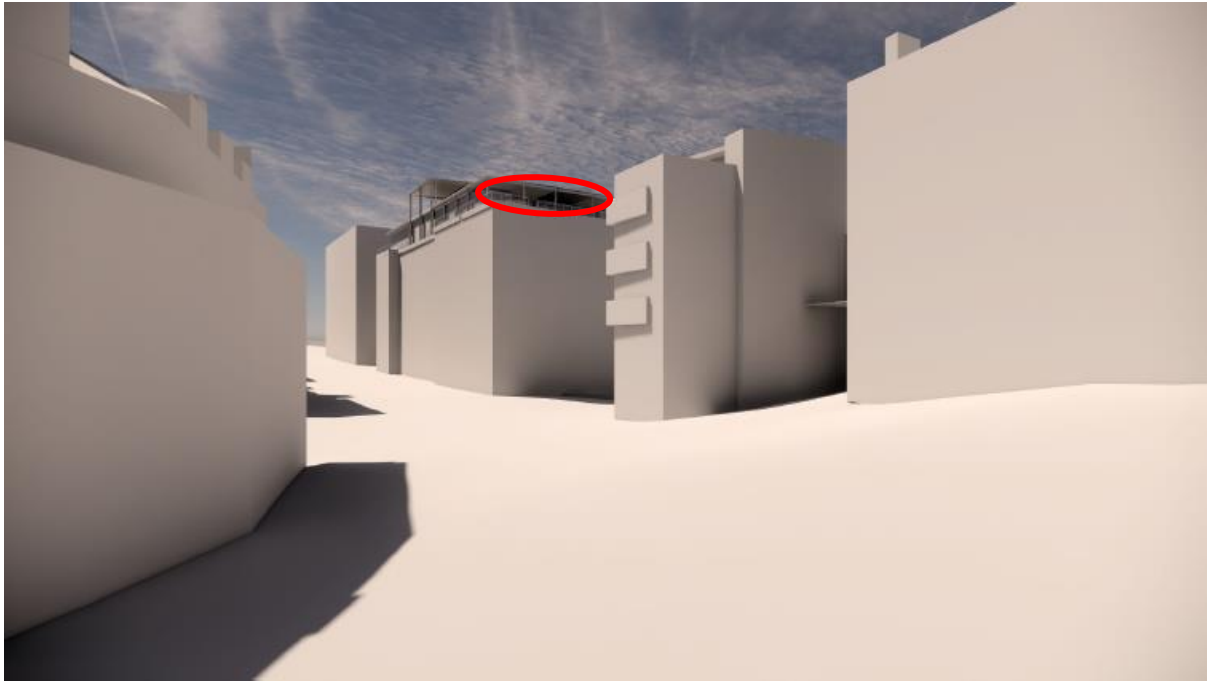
View analysis showing the proposed view from the intersection of Bowman Street and Point Street, with proposed additions circled red
